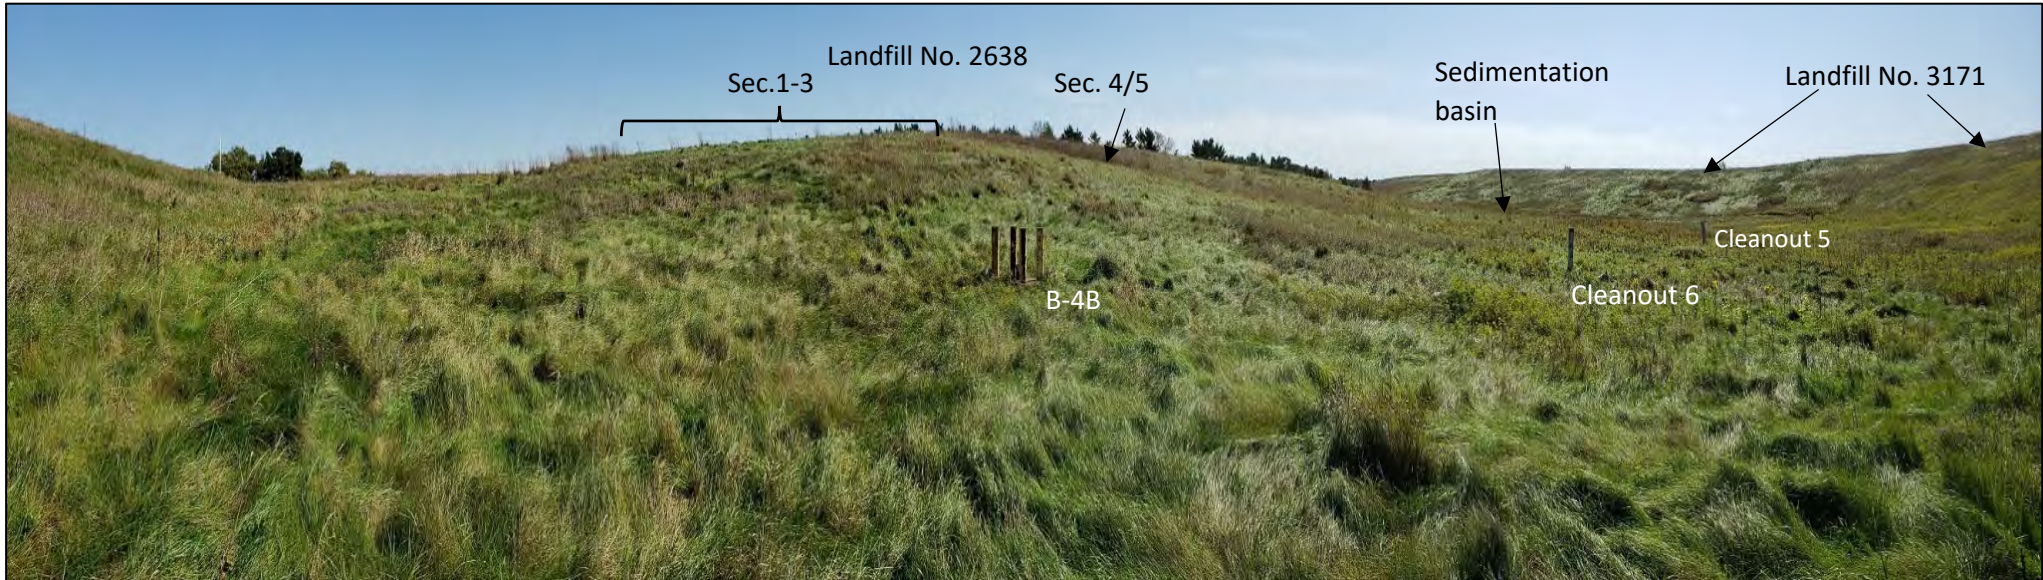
Panoramic photograph, west side of Landfill No. 2638. Looking east.
